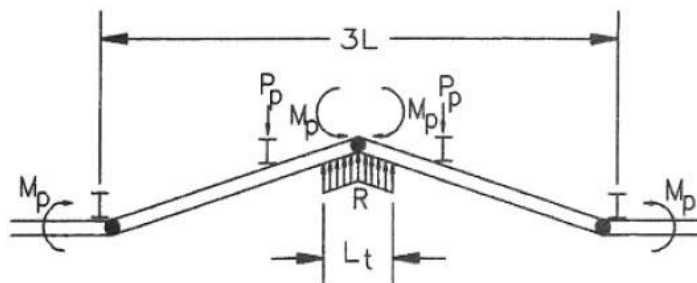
Three-Span Failure Mode for Post-and-Beam Railings
